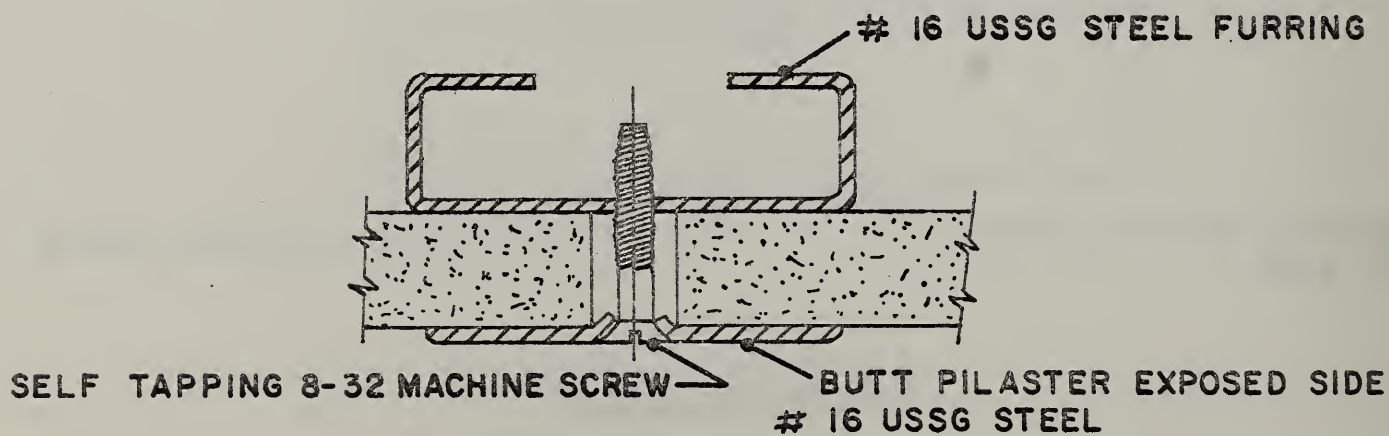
JOINER DETAILS FOR DOUBLE FACED CONSTRUCTIONS
